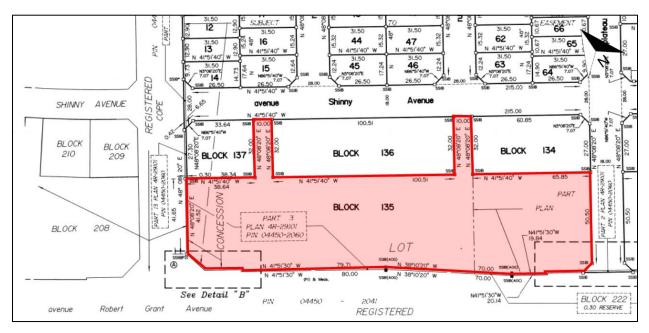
Excerpt of Plan 4M-1551 indicating Block 135 (the Subject Site) in red
